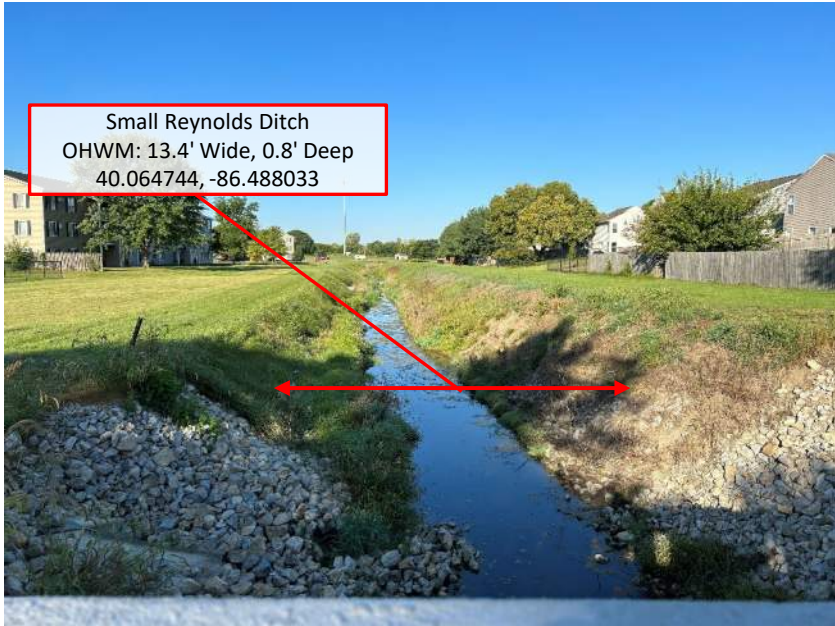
Witt Road over Small Reynolds Ditch - Looking west, downstream, along the stream towards SA 1.
